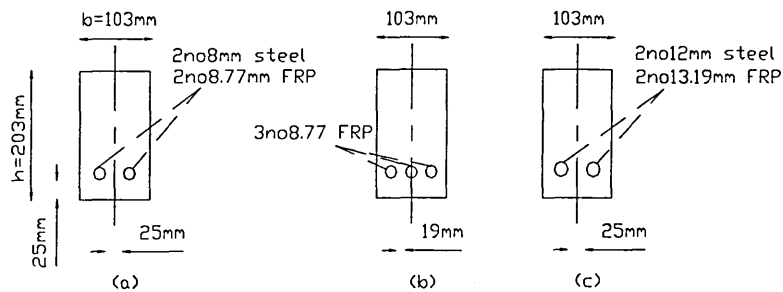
Details of the beam reinforced with 2 & 3 curved profile GFRP rebars
